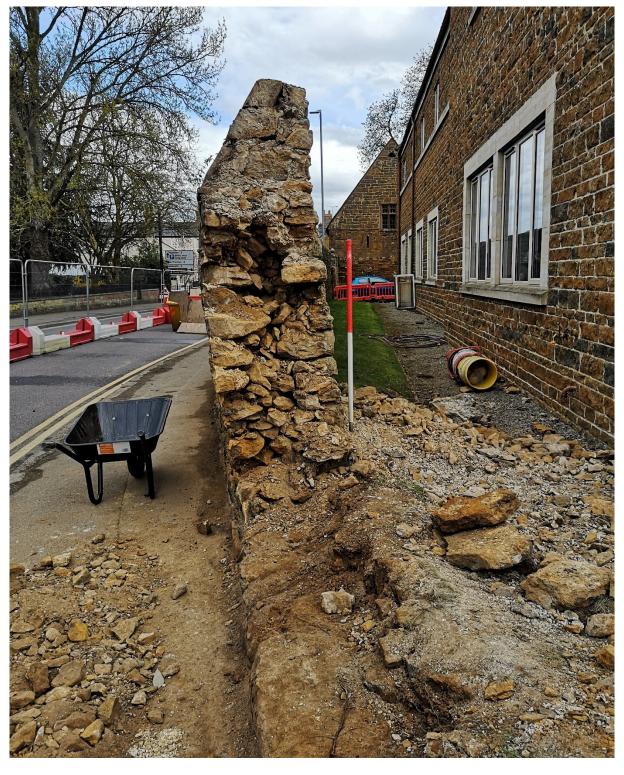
Wall (1) looking east, showing rubble core, mortared upper level, footings.
